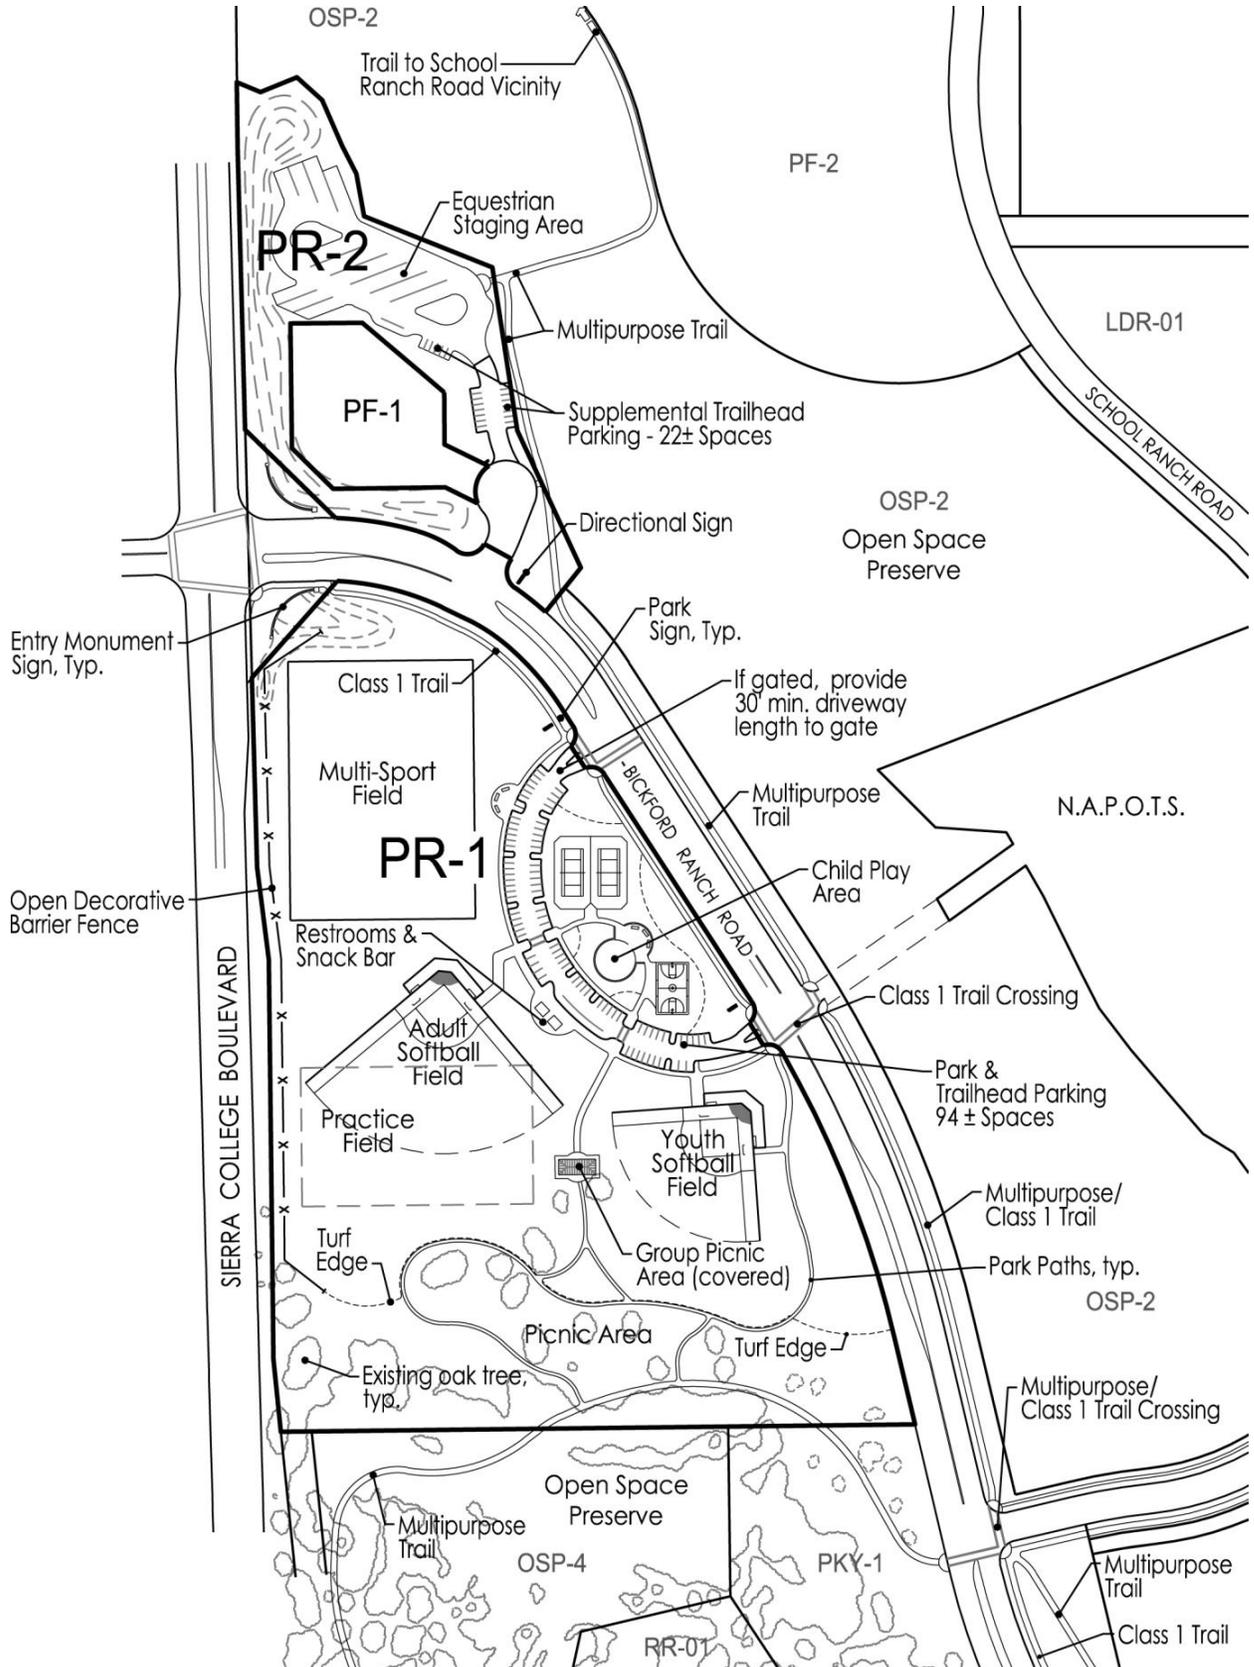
| Bickford Ranch Community Park – Conceptual Plan
